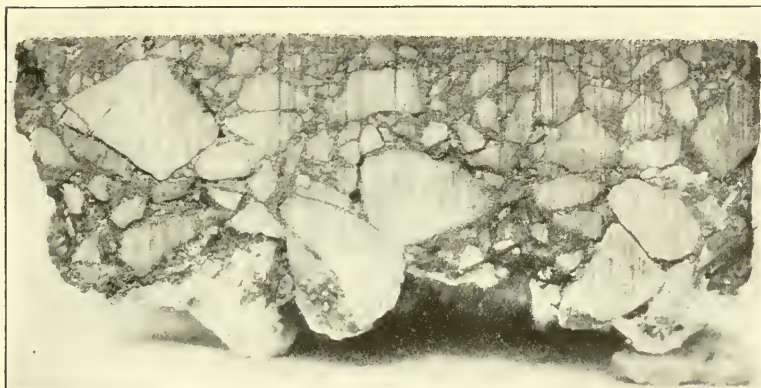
SEC. 6.—BITUMINOUS PAVEMENT KNOWN AS "AMIESITE." BUILT BY MACHINE-MIXING METHOD.
